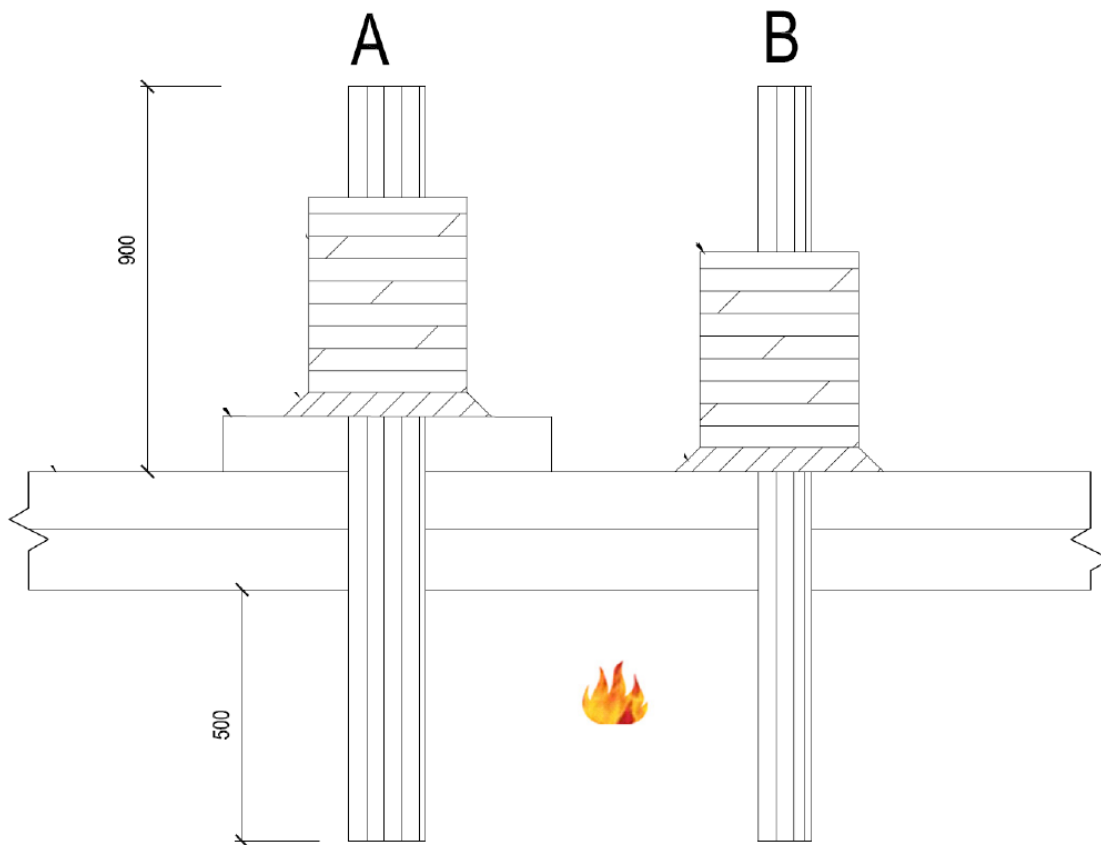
PROMASEAL® bulkhead batts in floors or walls penetrated by Co-axial cables as tested in A-19-018
